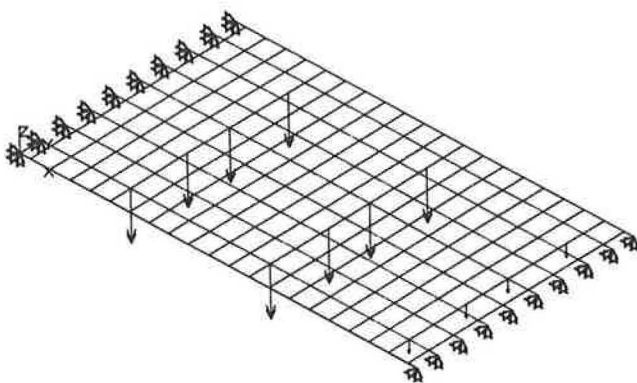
Typical DF grid model, 12.2-m span, two lanes, wheel load Case 2.
